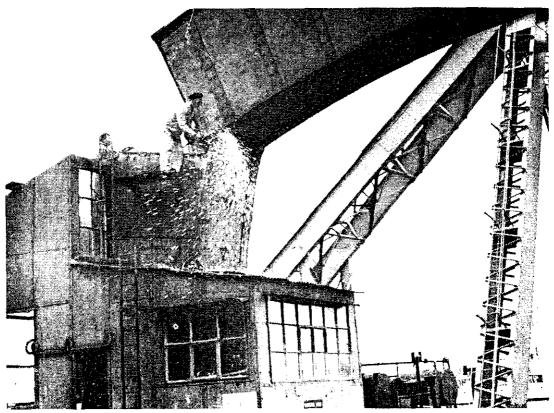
CUTTING THROUGH UNDERSIDE PLATING
